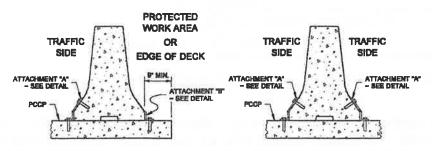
Washington State DOT's brackets used to anchor PCBs on bridge deck Source: WA DOT K-60.35-00
